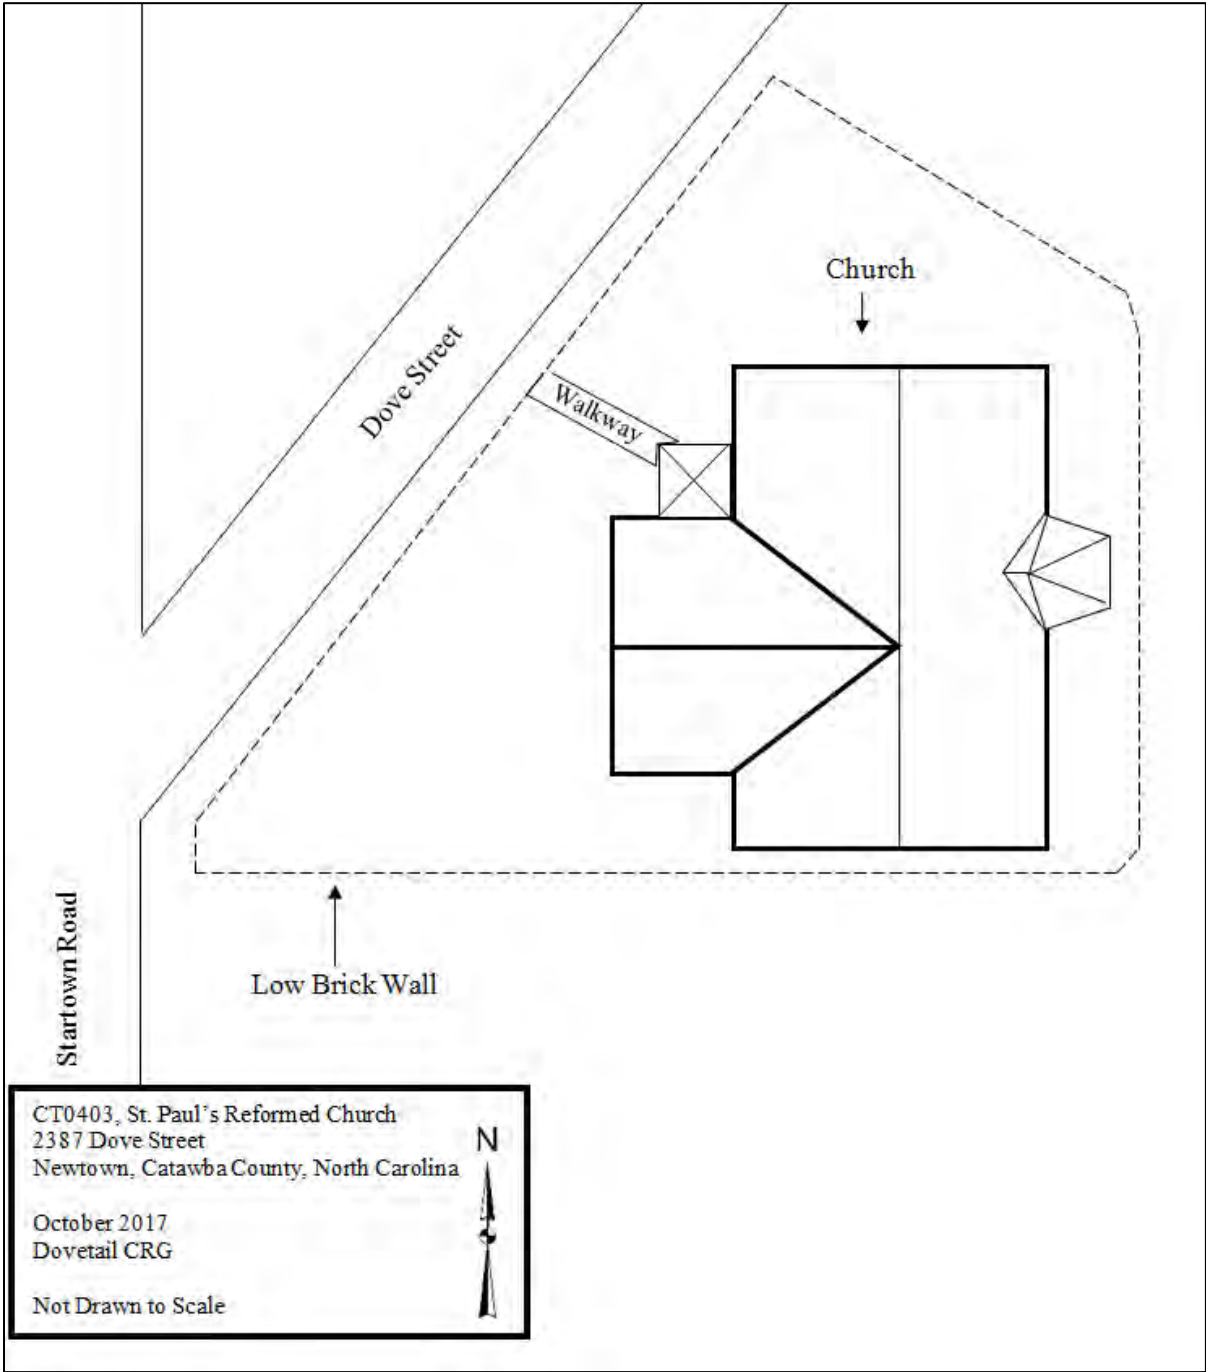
Site Plan for St. Paul's Reformed Church (CT0403).
